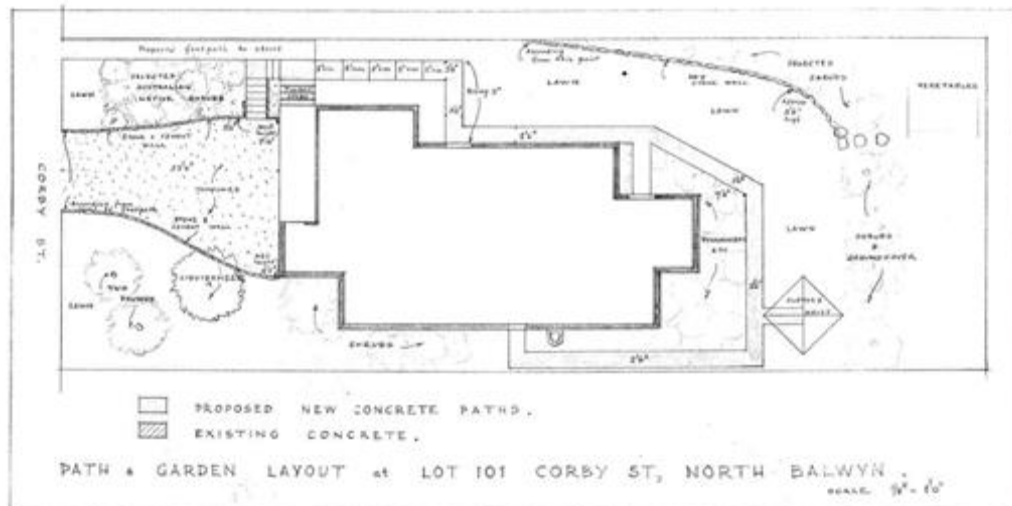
Original garden layout showing drive shape, timber and concrete steps to the entry deck and stone retaining walls. (Source: A Knox, Job No 319 undated (Withers Garden), Alistair Knox Foundation)
